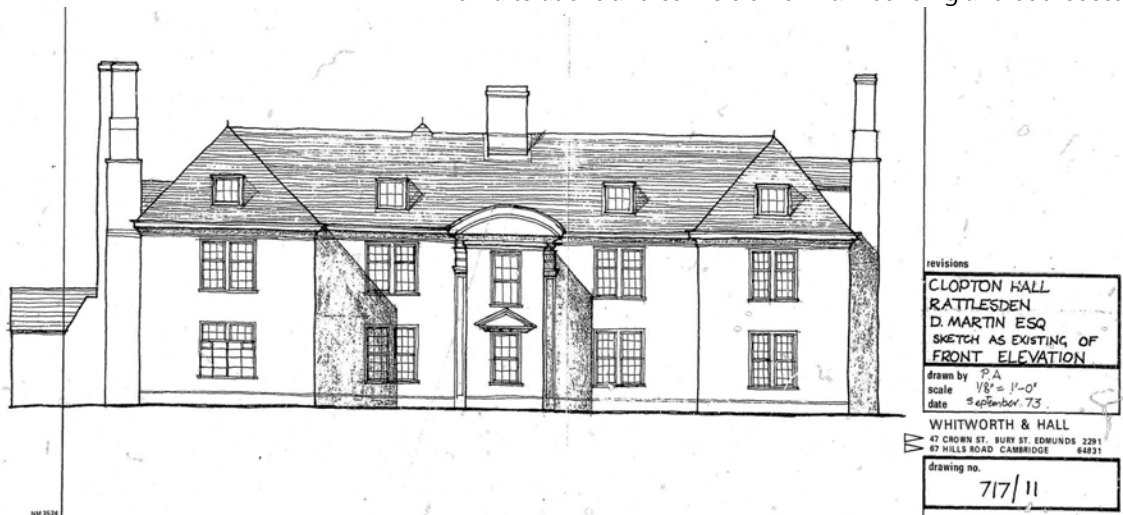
Existing Front Elevation Drawing from Planning Application ref: N/73/2371/TW, *ibid
